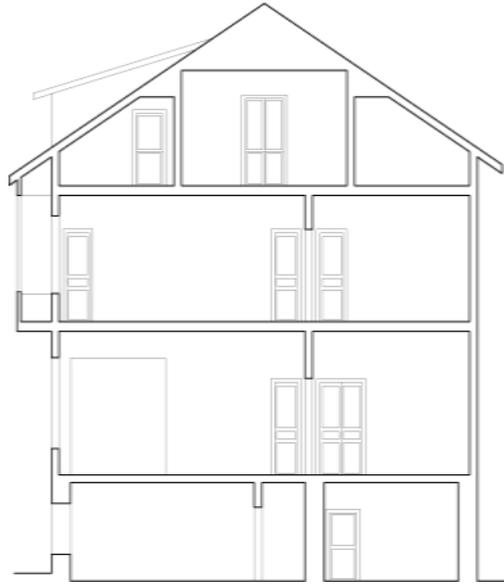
BB' section of the house at 137 lot 3 parcel
